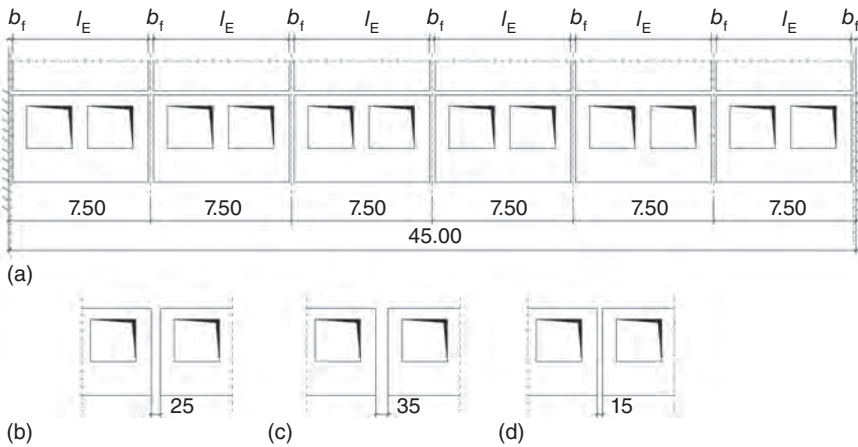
Joint widths following measurement on site: (a) elevation on and dimensions of façade, (b) nominal joint width, (c) maximum joint width, and (d) minimum joint width. Source: Taken from Ref. [5].
